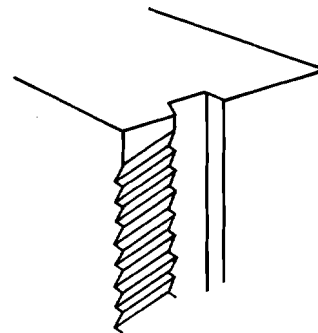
Washboard on face of a vertical joint to drain water back to the outside
